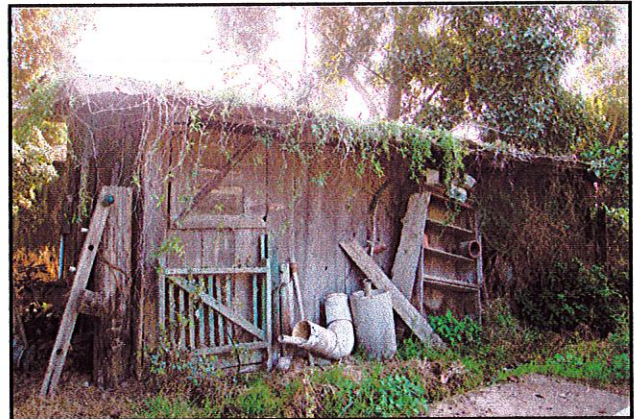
Utility building, built ca. 1925–1930. This view is facing southwest, toward the north elevation. Photograph date, November 5, 2002.
